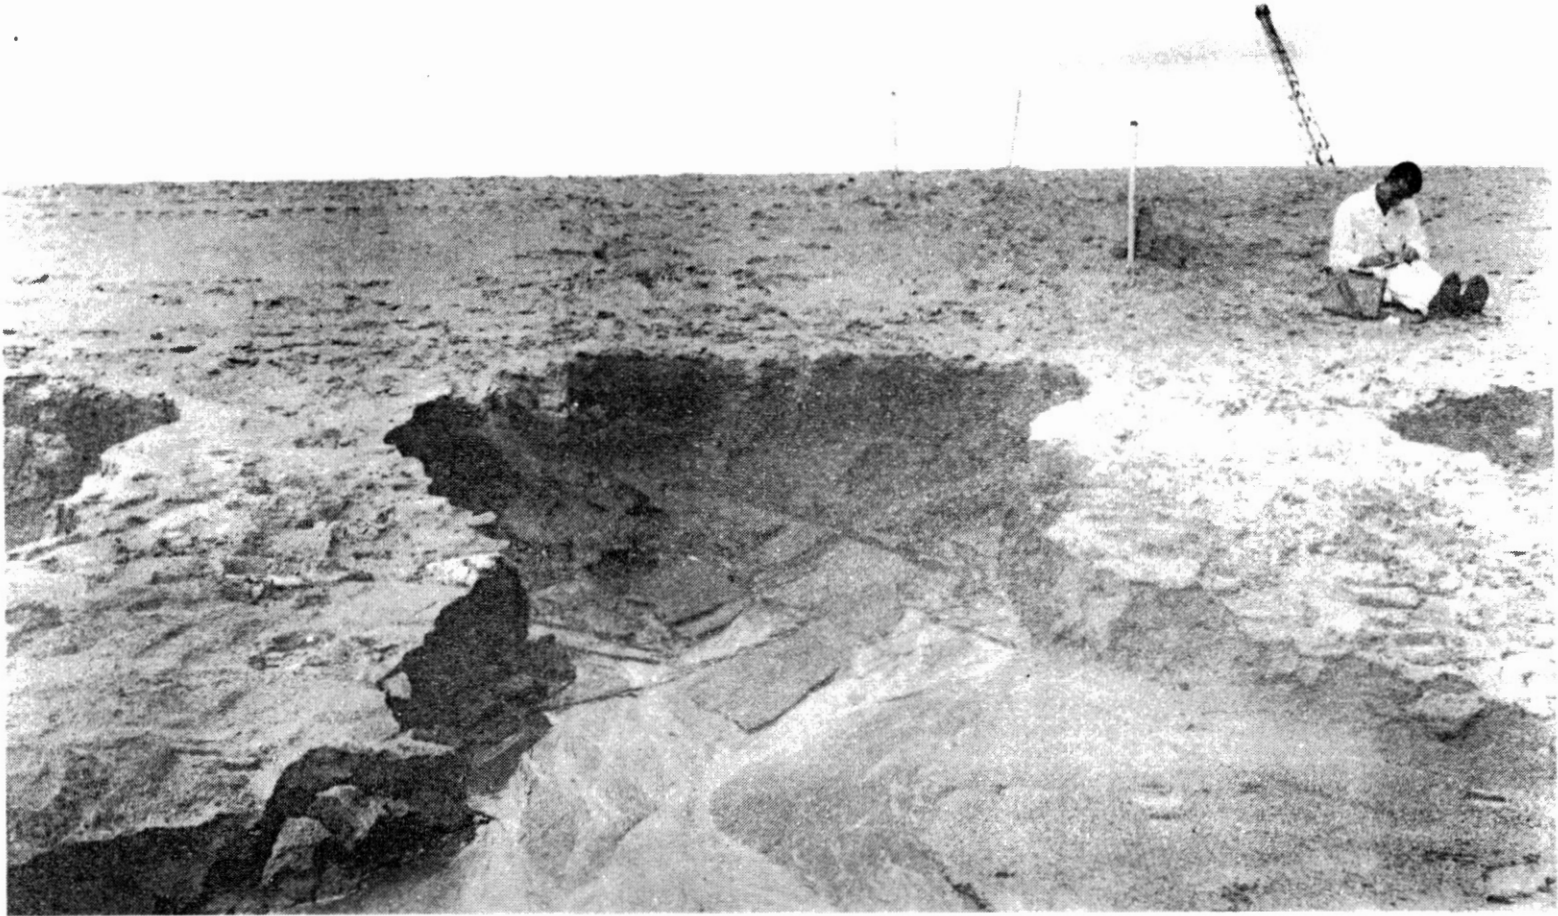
Landside Slope Erosion at Drury Test Section No. 3.
